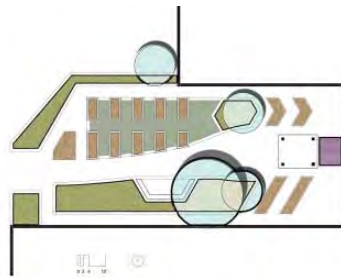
An early plan of the garden, showing native perennial beds and raised planters.
